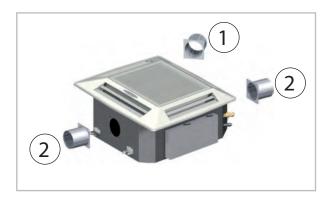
Connections to adjoining room and fresh air intake KWD 25-55
